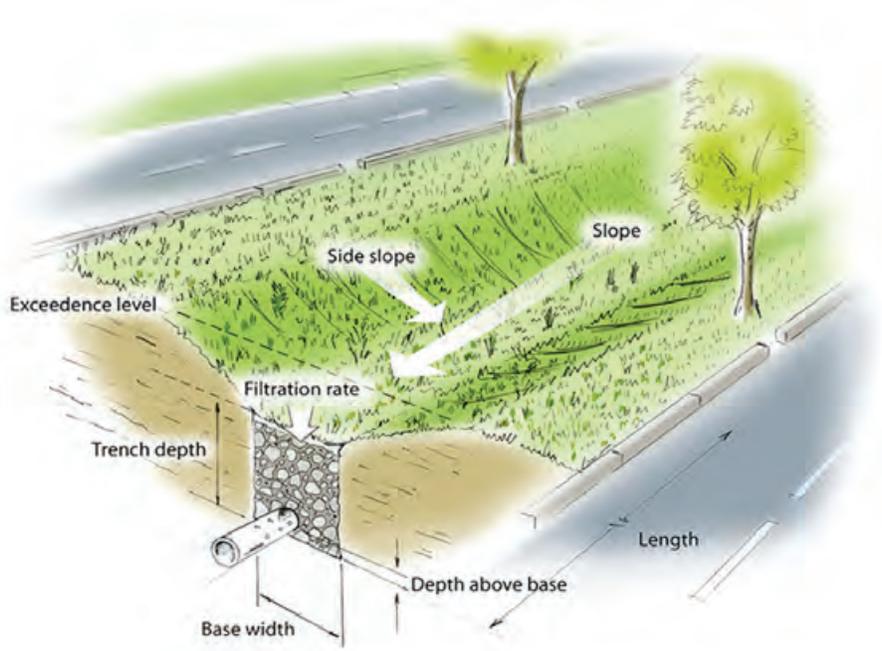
TYPICAL CROSS SECTION OF INFILTRATION SWALE
